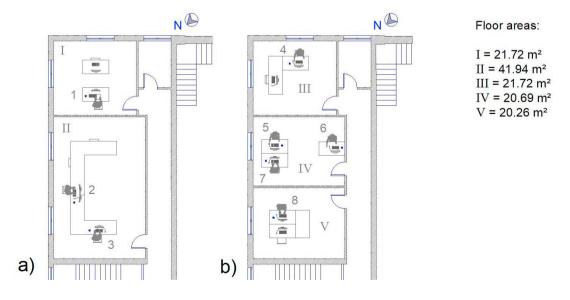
Workstations: (a) first floor; (b) ground floor. With black dot the point where nearable are installed
